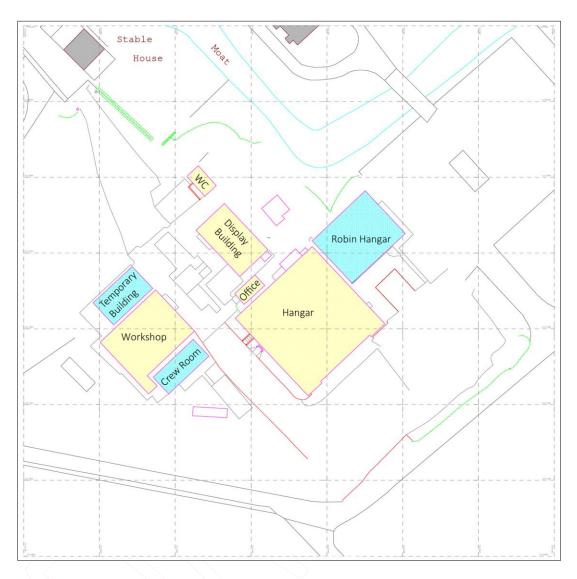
Site layout (retained buildings in yellow, demolished buildings in blue (scale 1:2000)
